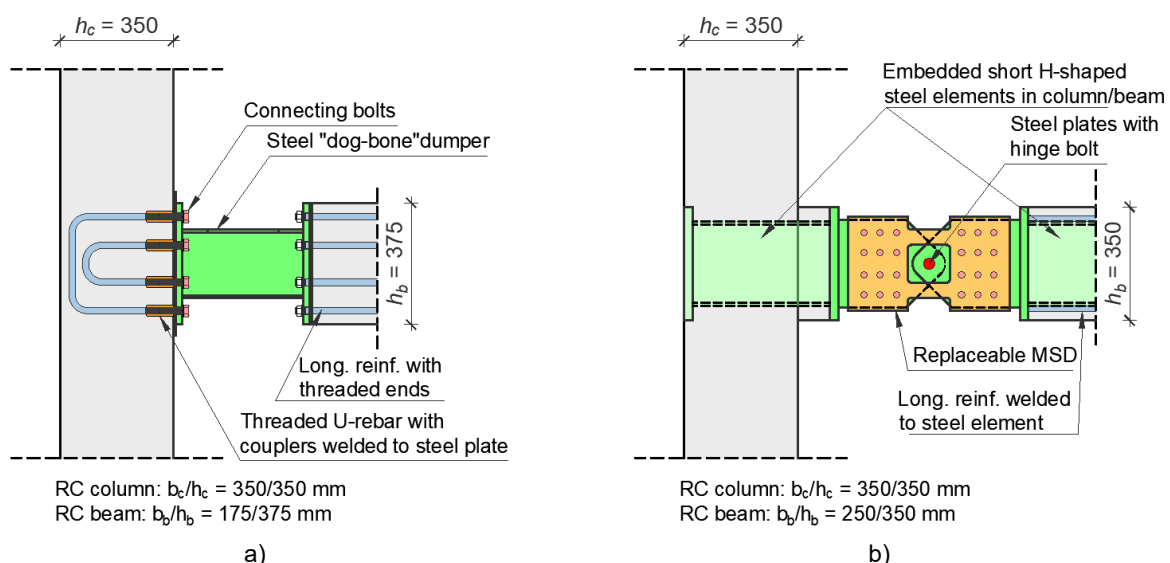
Beam-to-column joints with steel dampers: a) connection with steel “dog-bone” element (adapted from Wu et al. [38]), b) connection with steel “multi-slit devices – MSD” (adapted from Huang et al. [40])
